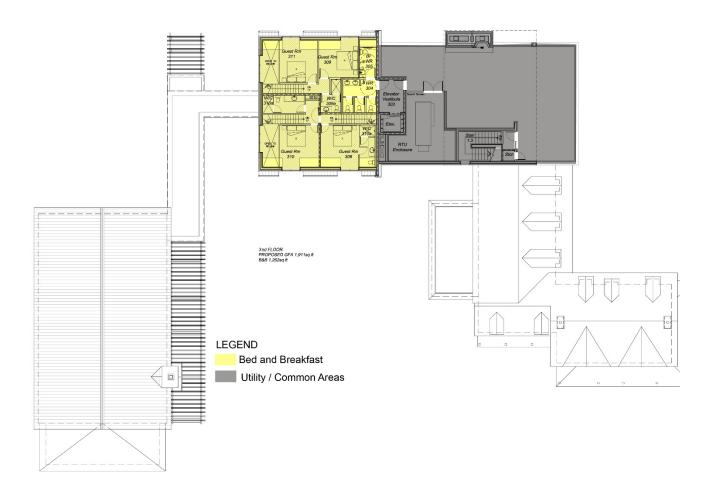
Upper Floor Plan, Expanded Farmhouse (Source: BPE Developments)
